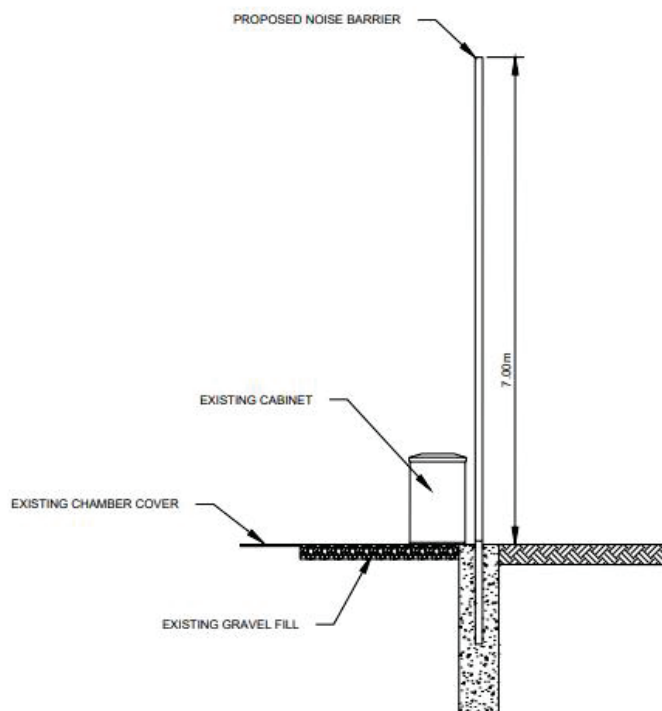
Section of proposed 7m high barrier adjacent to T5 POD Parking
